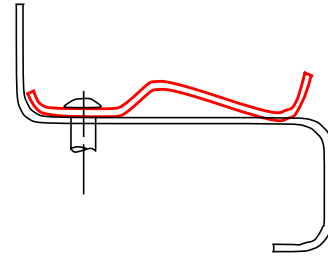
CSP 520-4 SPRING CLIP INSTALLATION (ACCESS DOOR SURROUND)
